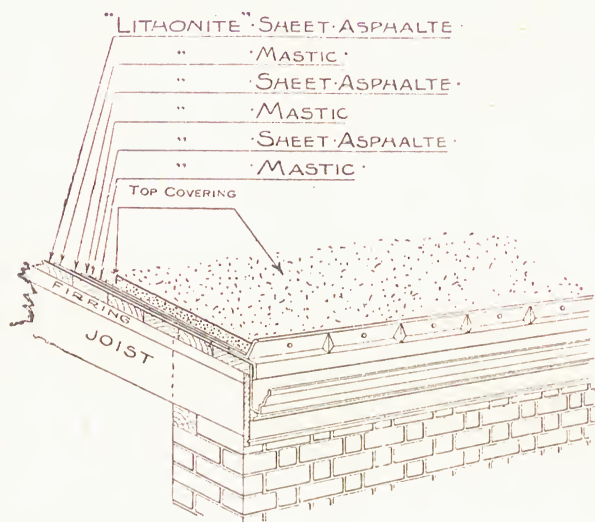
“Lithonite” roofing, boarded flat, showing eaves.
